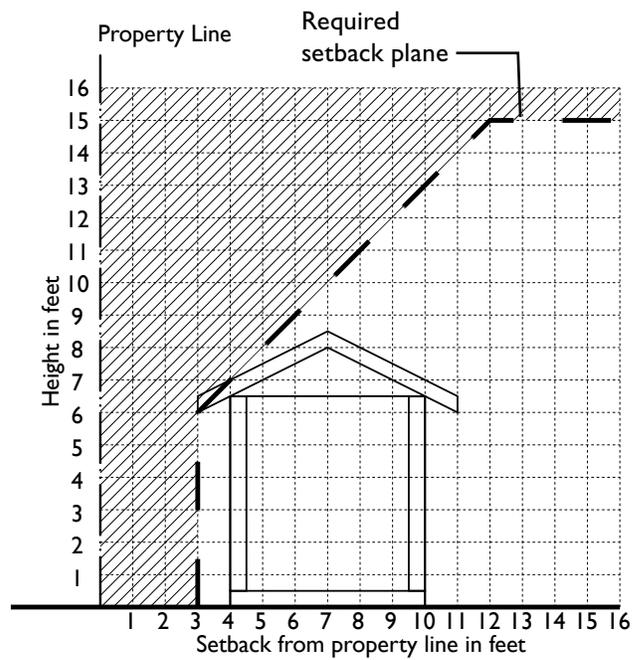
Illustrative example of Major Accessory Structures with low-pitched roof.
